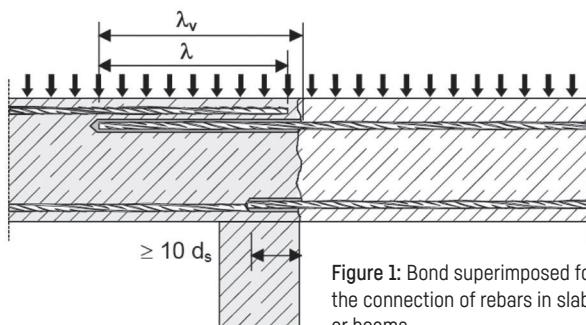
Bond superimposed for the connection of rebars in slabs or beams.
